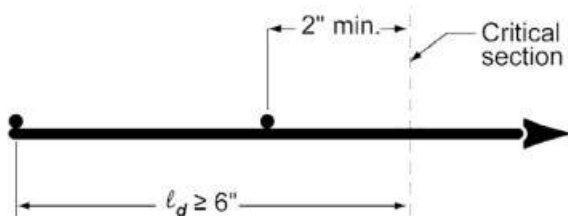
Development of Plain Welded Wire Reinforcement (adapted from ACI 318-14, courtesy of ACI)
